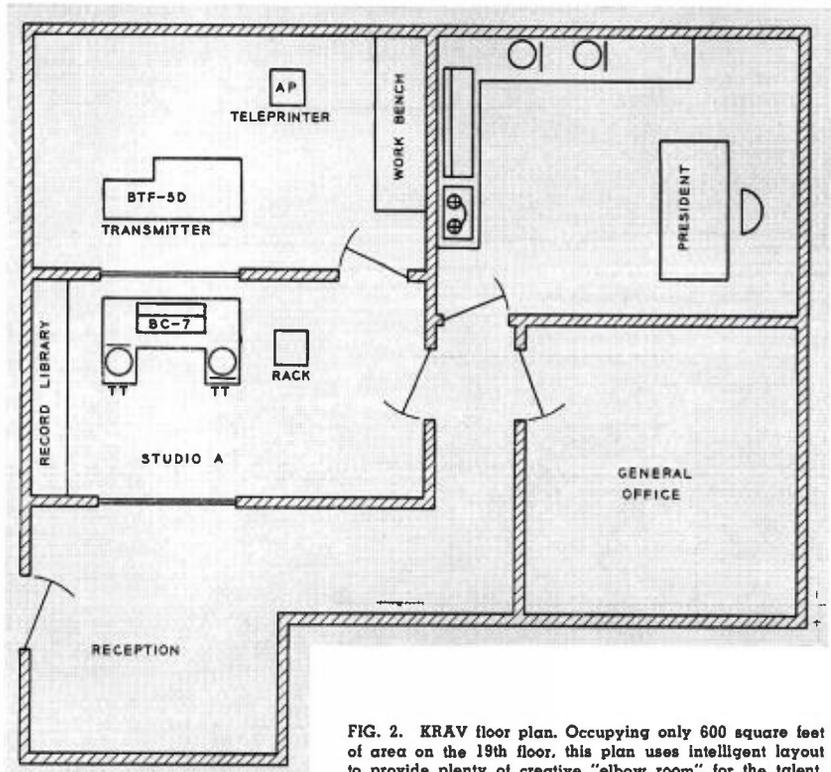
KRAV floor plan. Occupying only 600 square feet of area on the 19th floor, this plan uses intelligent layout to provide plenty of creative "elbow room" for the talent.
